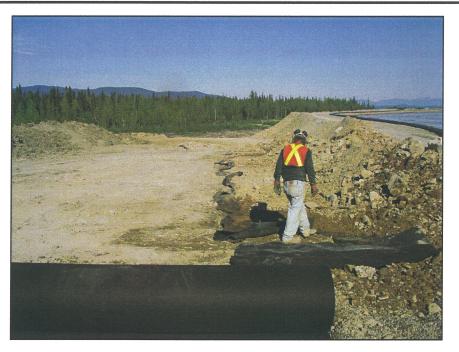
Mount Polley Mine Site. Tailings Storage Facility in the foreground.
